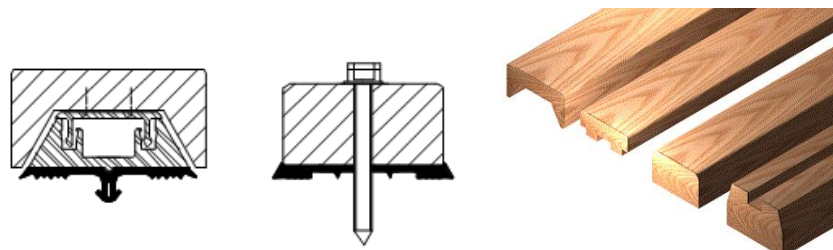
A Typical Timber Capping for Curtain Wall Systems Instead of Using Aluminium (Fassaden Windows, 2009).
